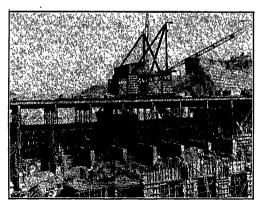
View of Traveler Crane used in Construction of Concrete Work for Powerhouse
